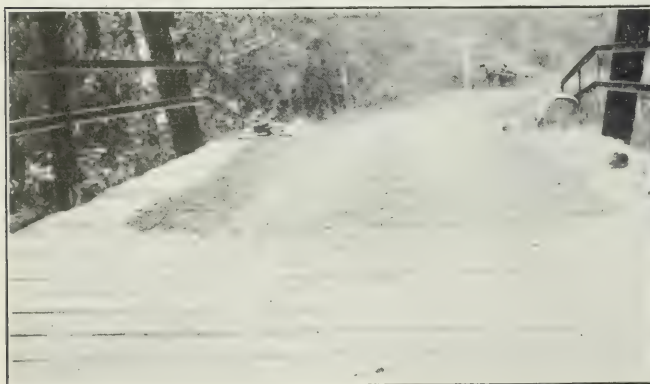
SHOWING CONDITION OF OLD BRIDGE FLOOR PRIOR TO APPLYING BITUMINOUS MIXTURE
